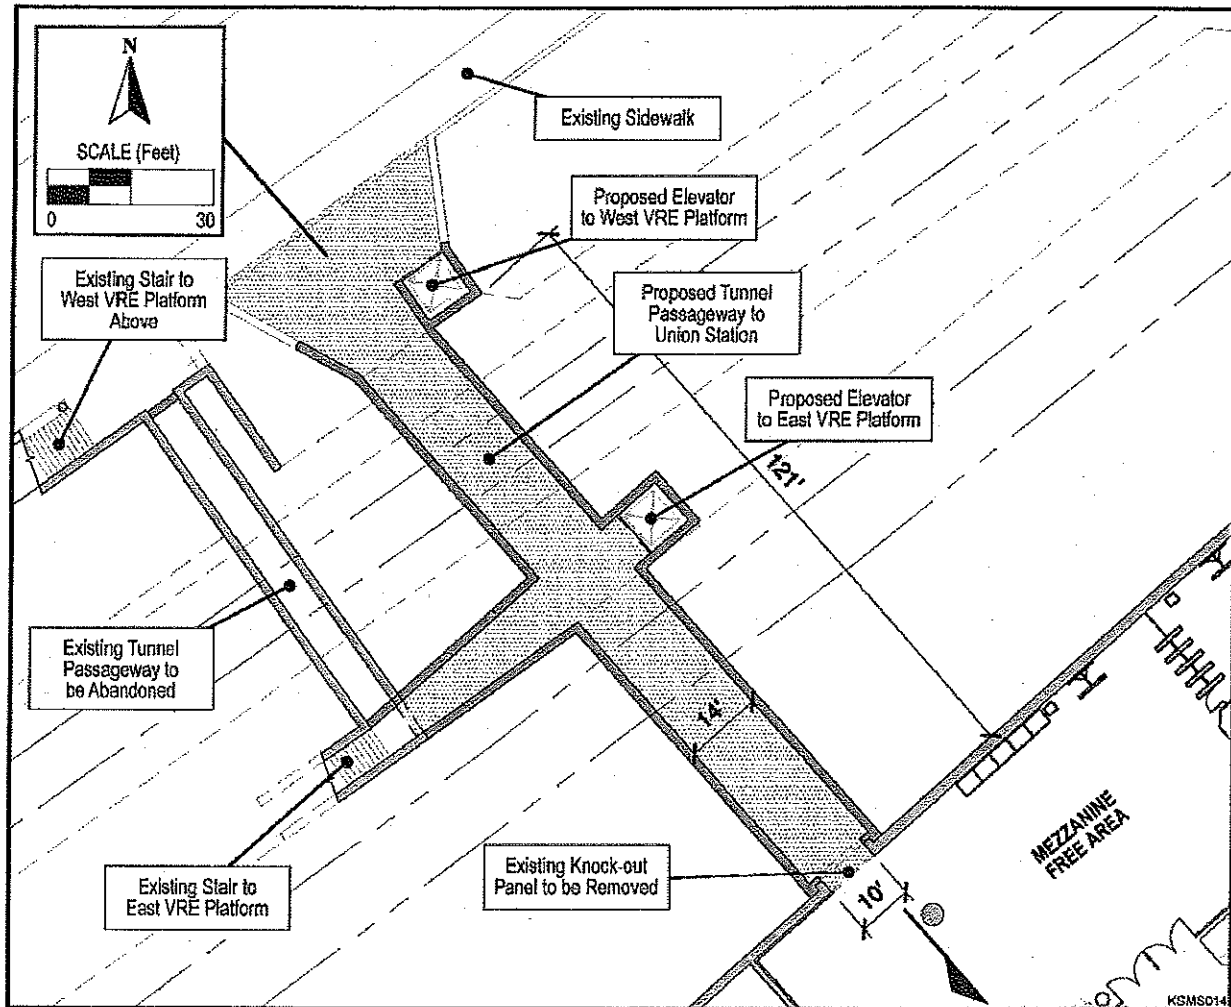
Aerial Plan – Union Station Tunnel Passageway Connection
